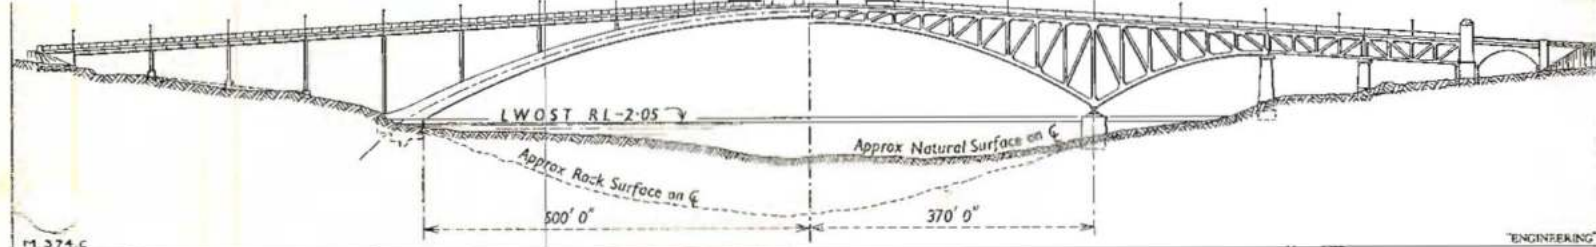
Elevation of the adopted concrete arch (left) and the Department of Main Roads' original steel multi-span design.
